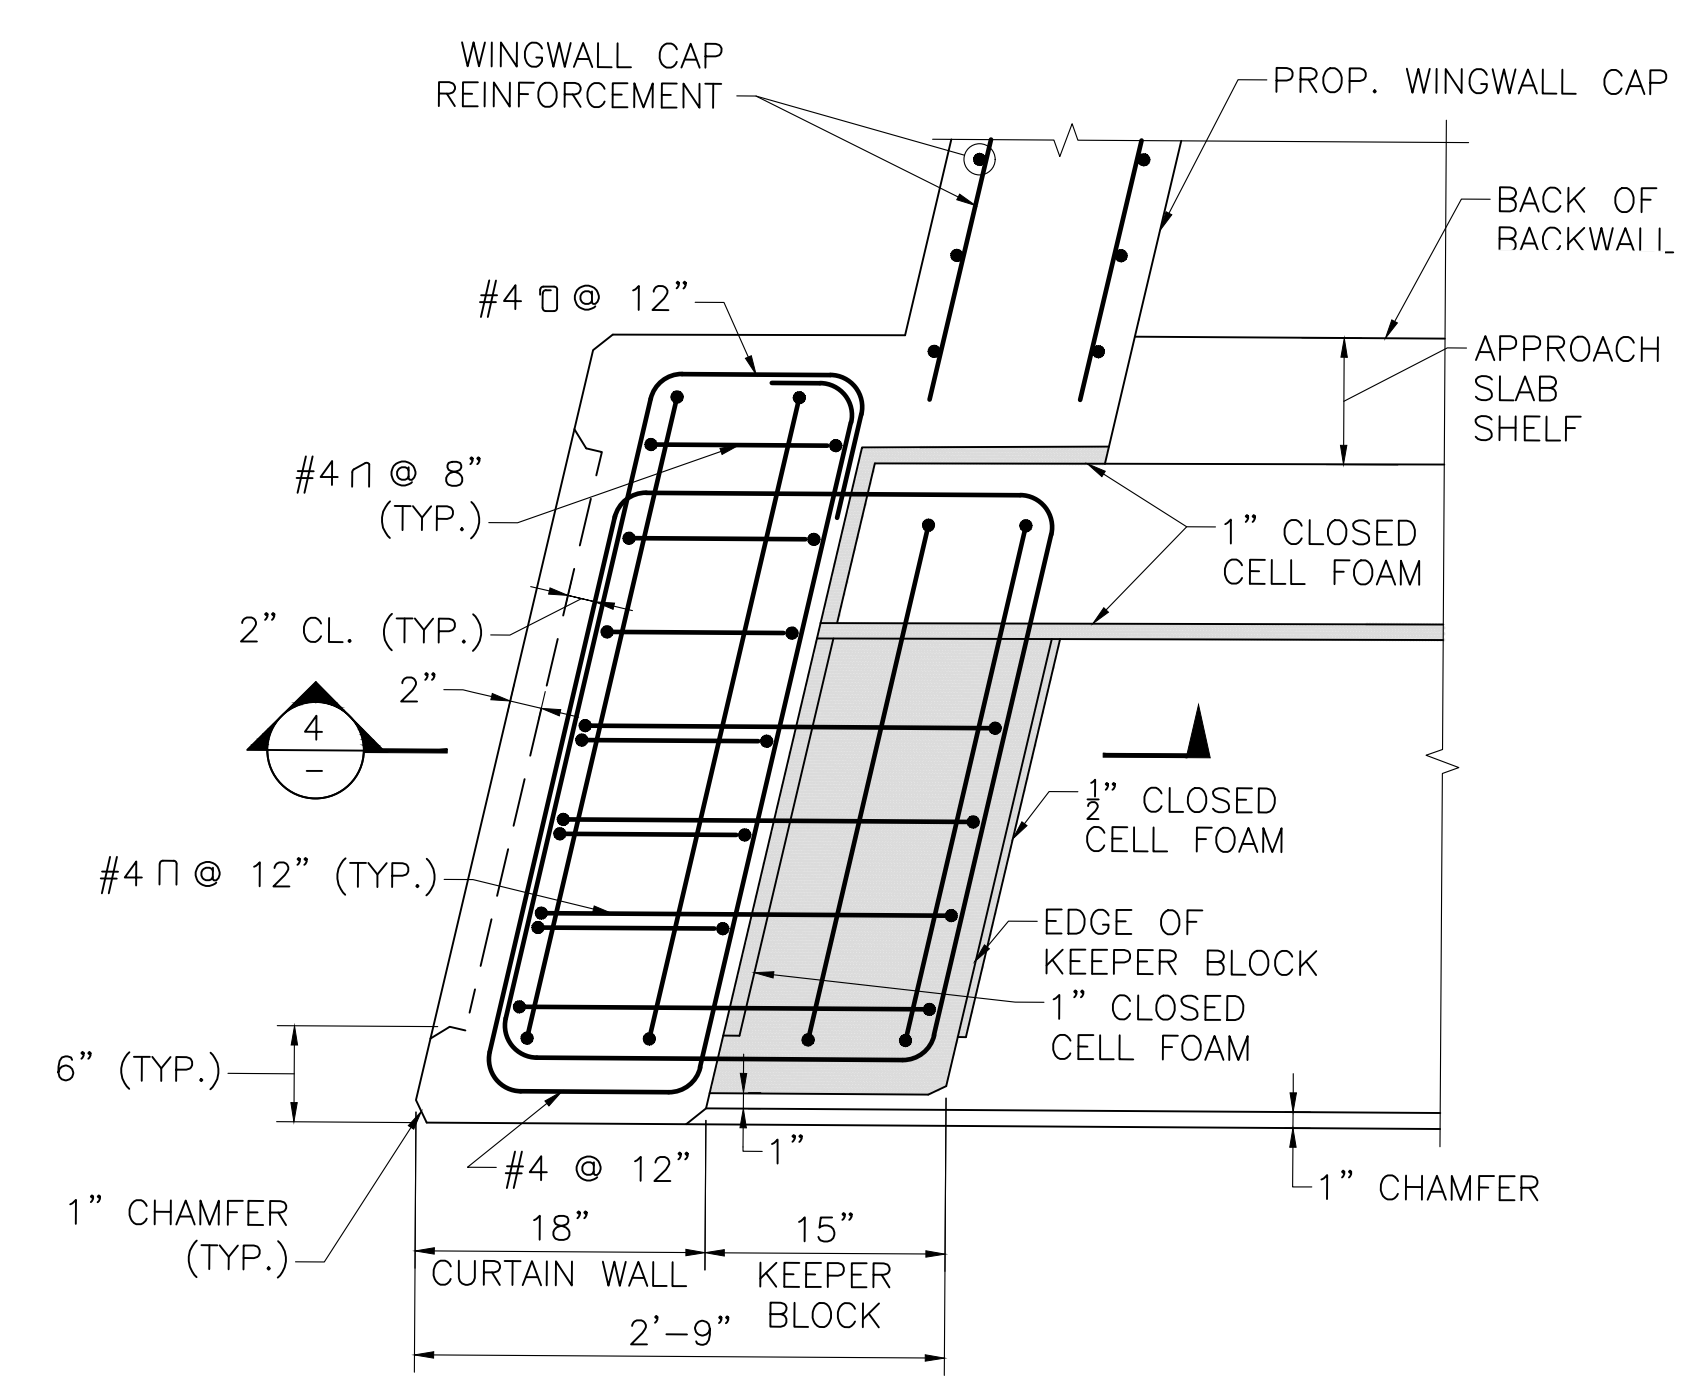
DETAILS AT ABUTMENT - SIDEWALK SECTION
